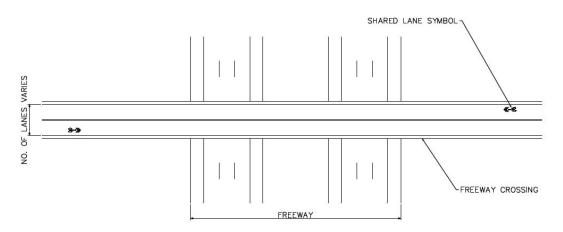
Plan View of Shared Lane Added to Existing Crossing
